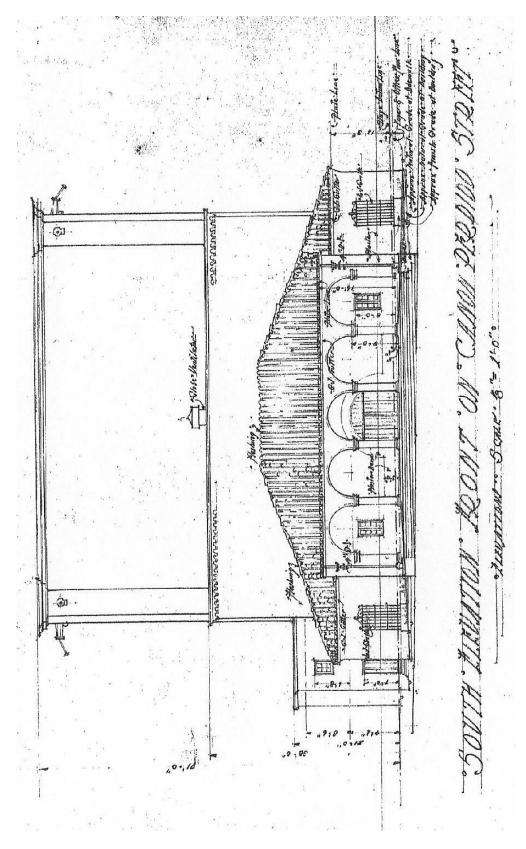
Canon Perdido Elevation of the Lobero Theatre showing the concept for an esplanade and steps (George Washington Smith, "Little Theatre for Lobero Theatre Company", Ops. 154, Sheet 5. "Elevations". November 6, 1923)
